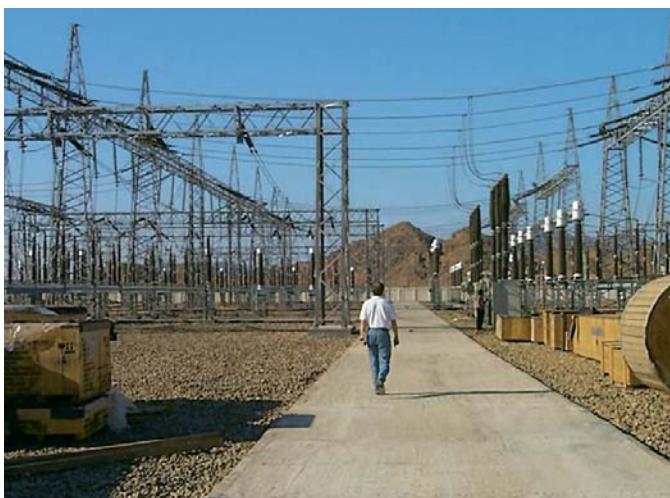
Central/center tower arrangement, 220 kV, Egypt
